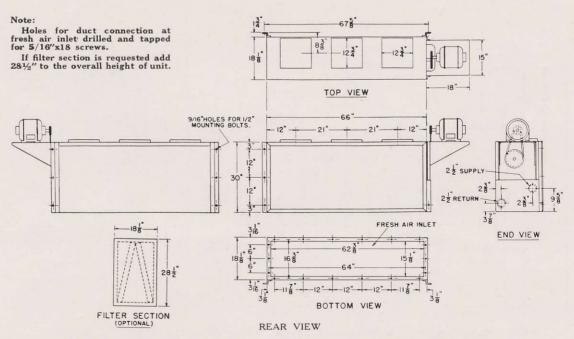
No. 1866 Type "R" Unit Heater. Wall Mounting.
